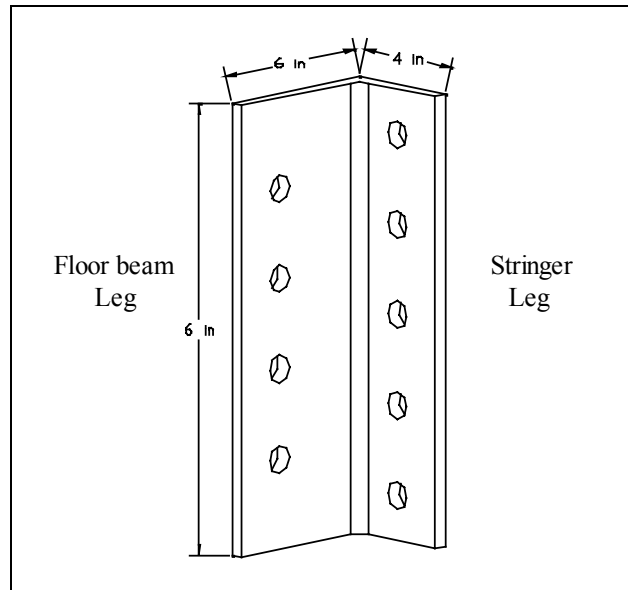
Retrofit strategy #2 used to replace damaged clip angles on the Winchester Bridge in 1994
